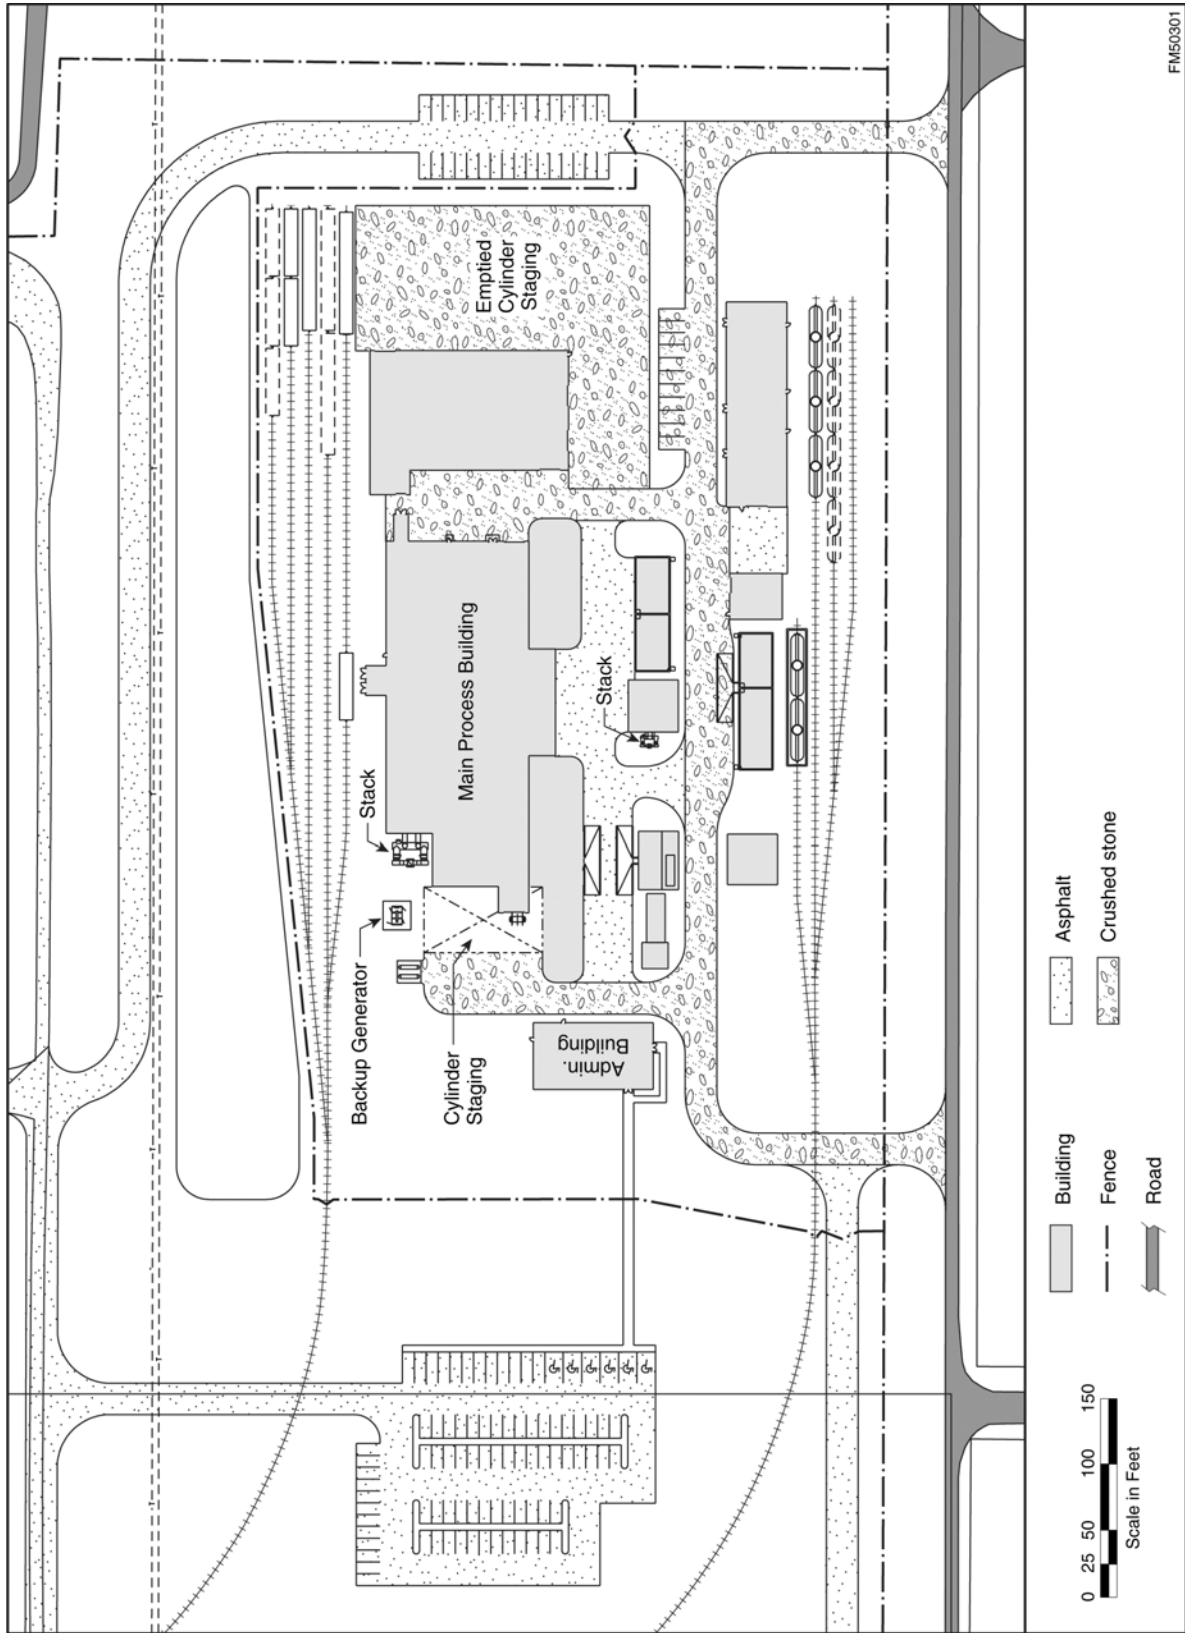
Conceptual Conversion Facility Site Layout for Paducah
